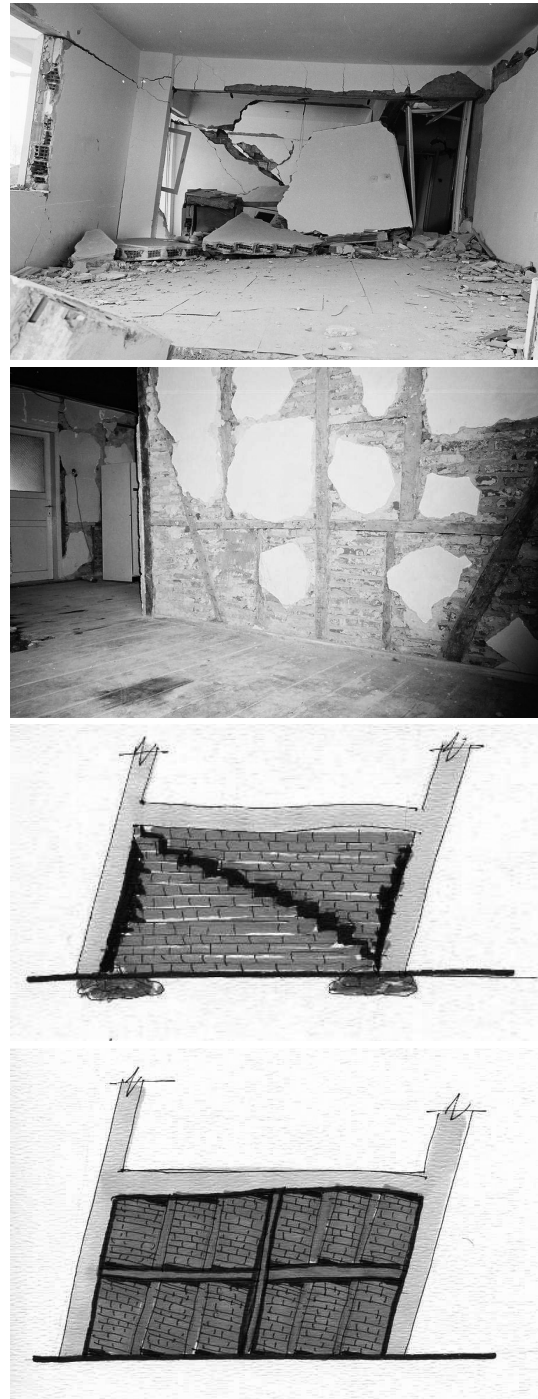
Brittle infill walls (top photo and top drawing) compared with traditional *humuş* (2nd from top) and with proposed “Armature Crosswall” (bottom drawing).
